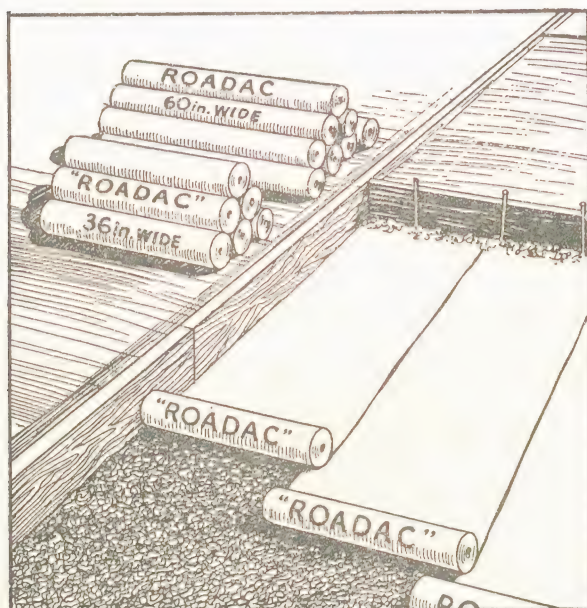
Waterproof building paper laid over ground to protect concrete from ground impurities and absorption of moisture. (The Concrete Tool Supply Co.)
